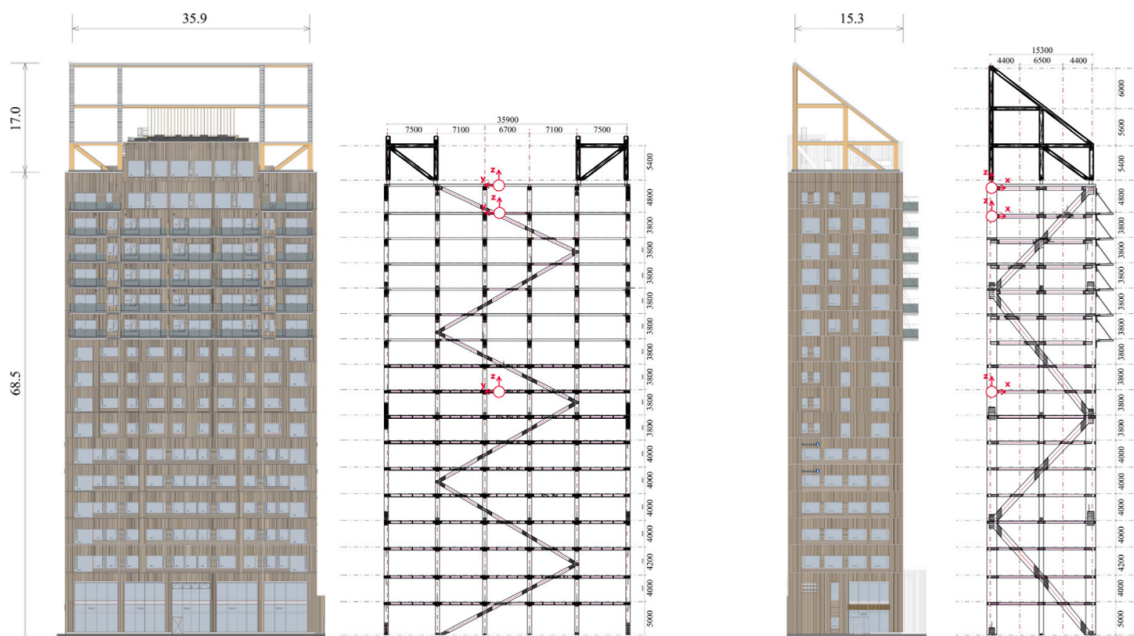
Mjøstårnet building and frame structure; front- and side view. Adapted from [52, Fig. 1 & Fig. 5a].
